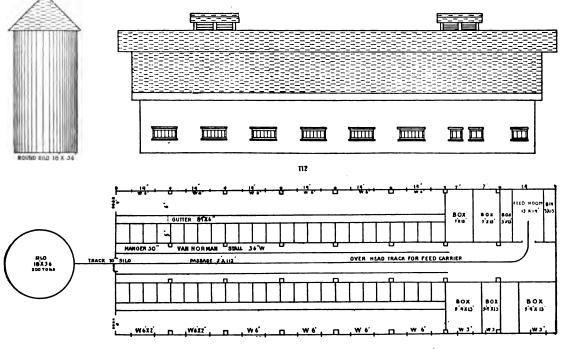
BARN FOR 50 COWS (SIDE ELEVATION AND GROUND PLAN).
